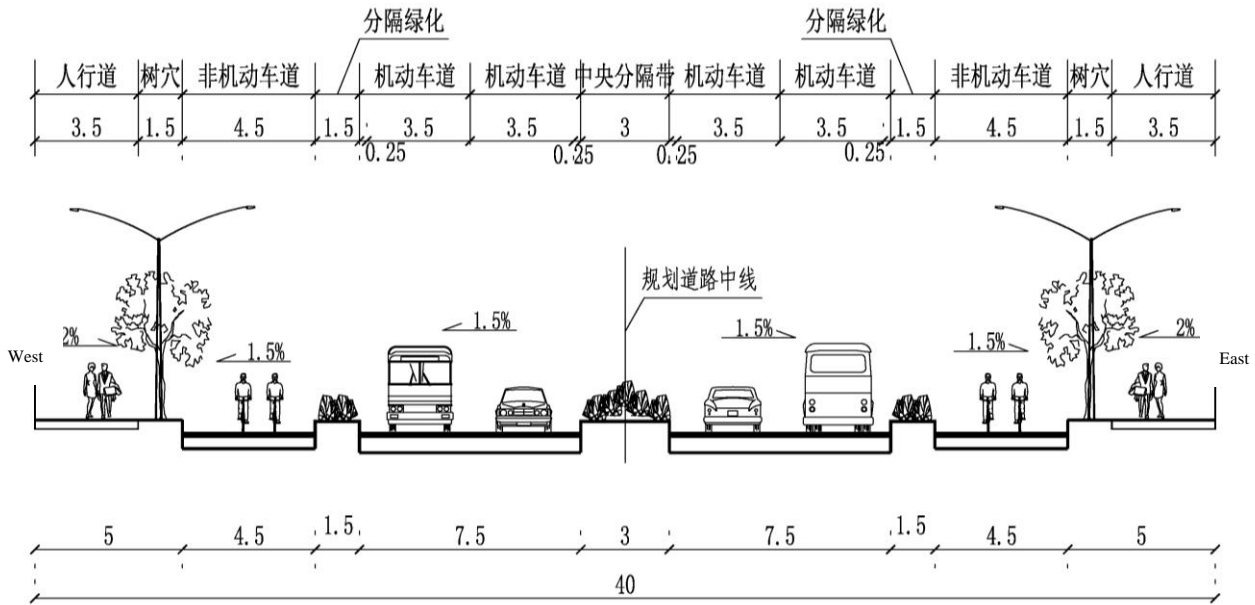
Standard Cross-Section of Fucheng Avenue (Yinxing Avenue ~ Jiefang Avenue)
